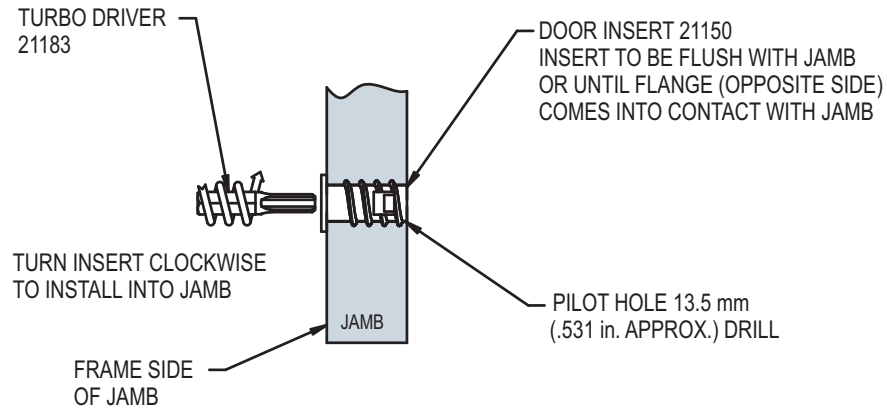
ADJUSTMENT OF JAMB JACK III FOR DOORS
